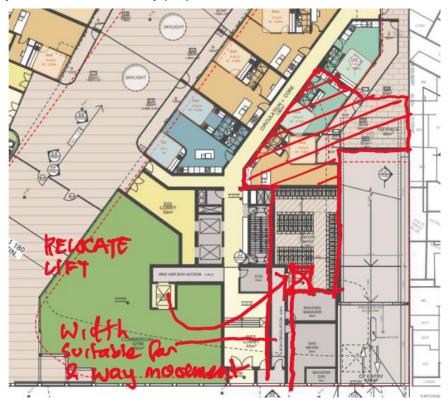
Original Application Mr McGauran Ground Floor Mark Ups
